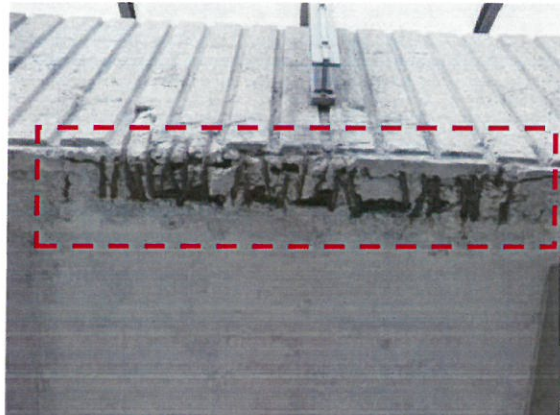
Concrete spall and exposed reinforcement on the underside of edge beam on pedestrian bridge
